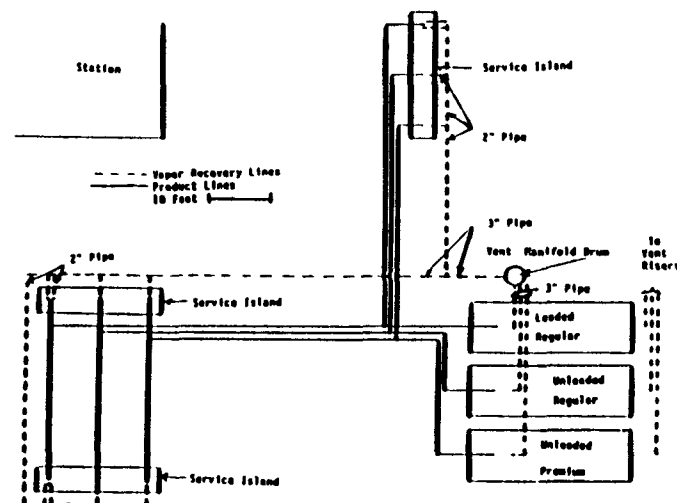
Stage II Underground Piping Layouts for Model Plant 3
